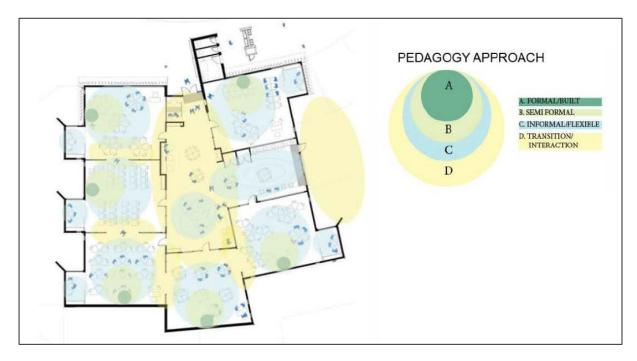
| Typical primary school building flexible use layout plan (source: RtS 2019)
